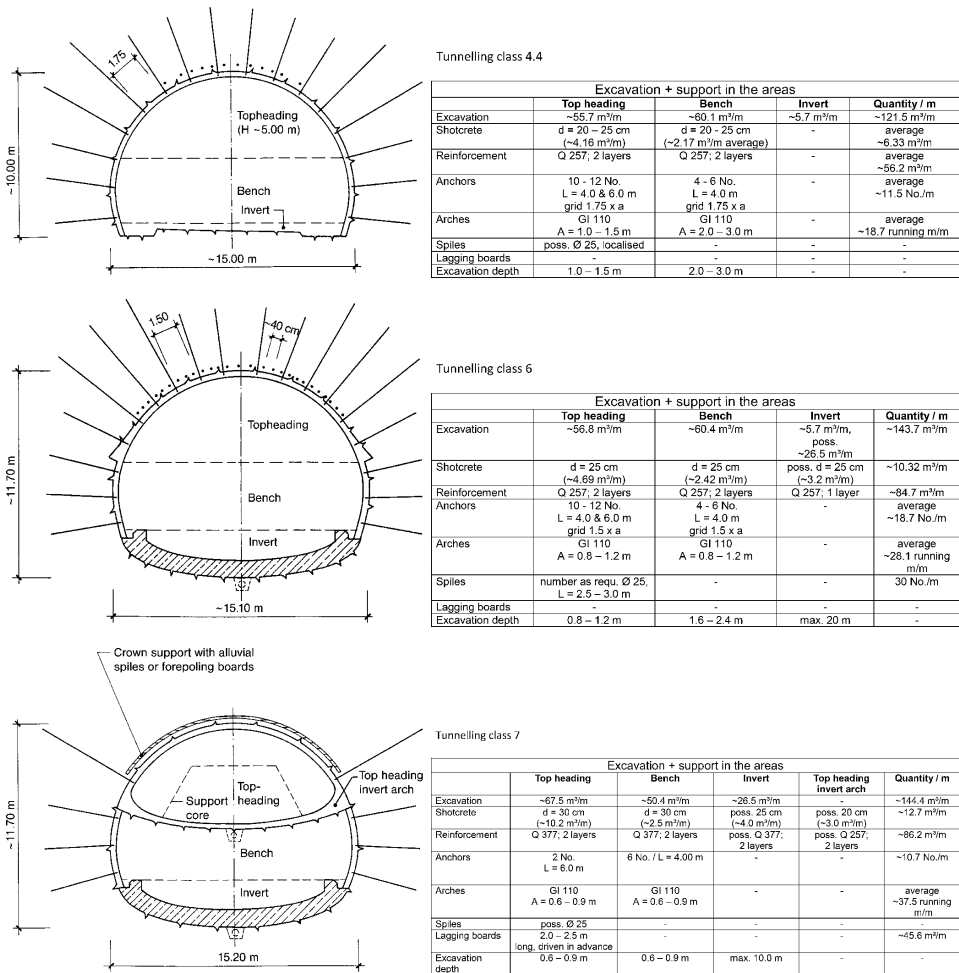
Summary of the tunnelling classes for the Oerlinghausen Tunnel (VK 4.4/6/7).
